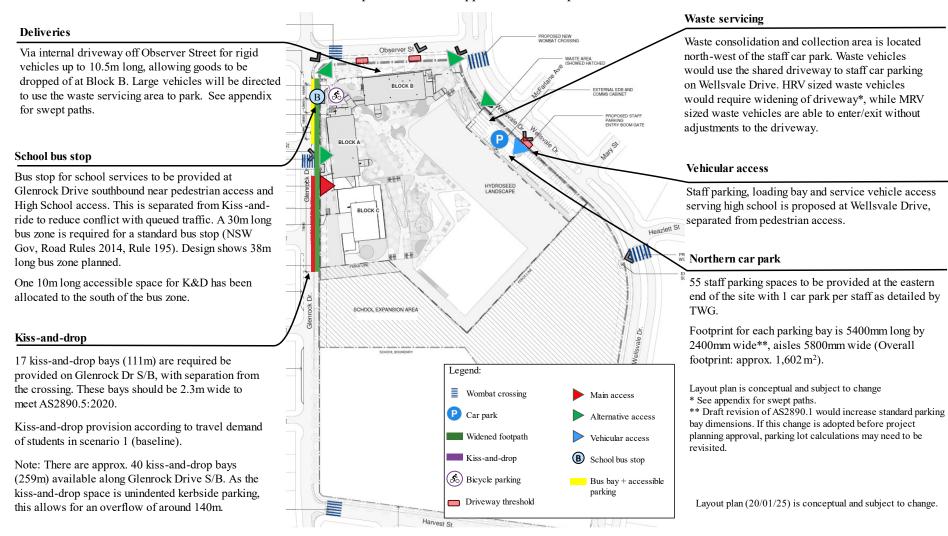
Vehicles and public transport site access and provisions. Layout plan dated 20/01/2025 is conceptual and subject to change.
